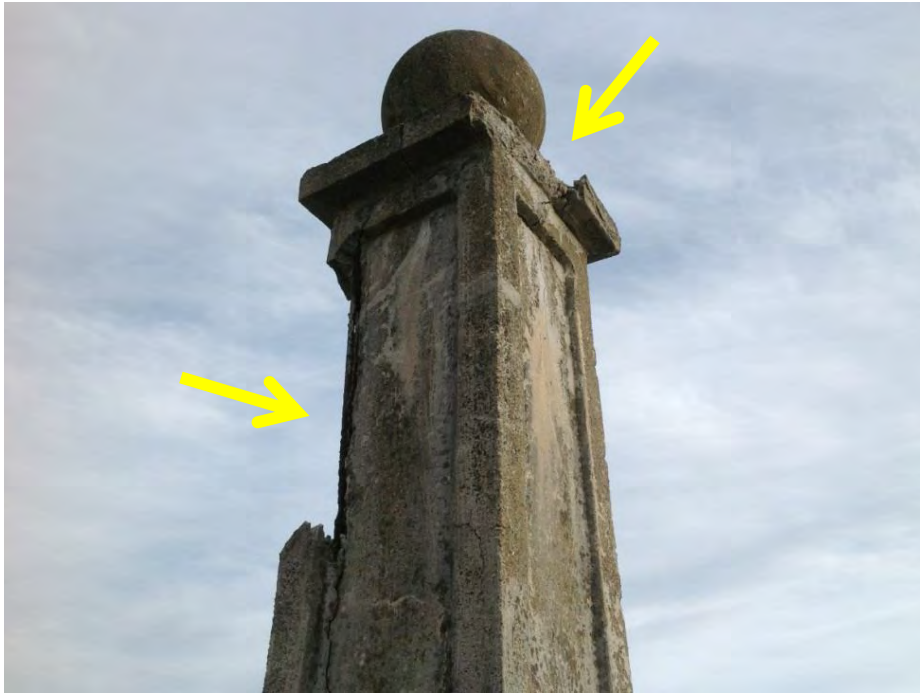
Horizontal crack below coping at rear perimeter wall.
